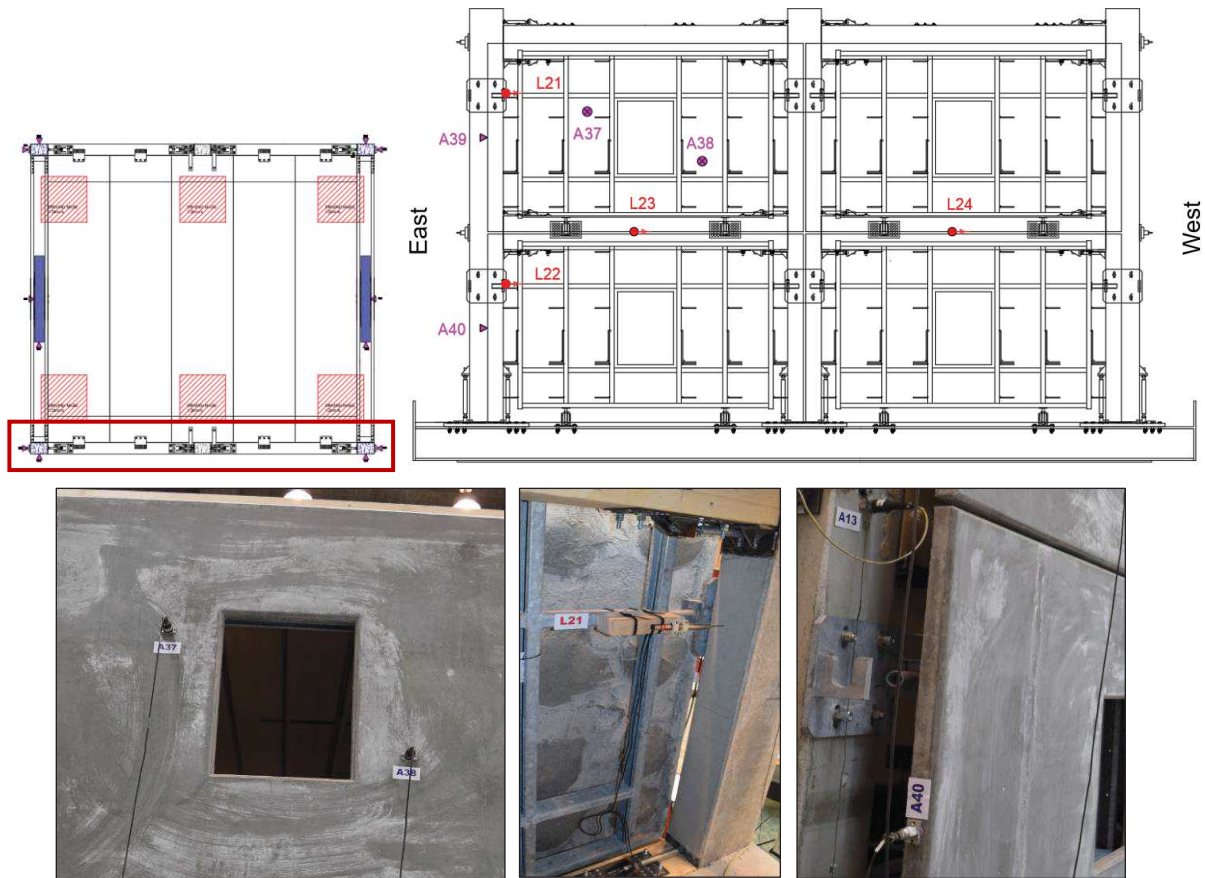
Instrumentation plan for the GFRG façade in the North side: schematic drawing (top) and photos (bottom).
